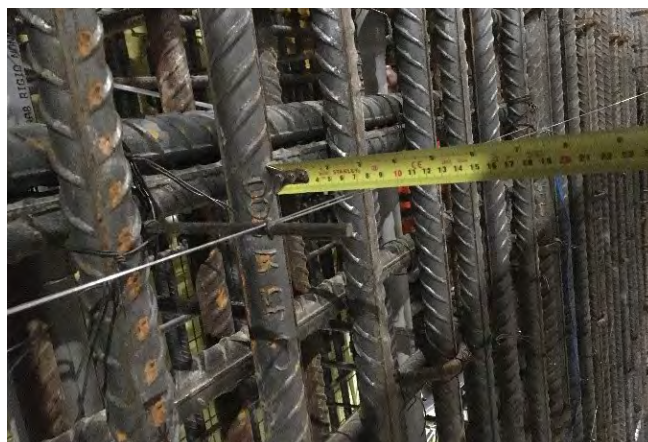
Shotcrete inspector measuring the concrete cover between the front mat of rebar and the shooting wires which are stretched taut and define cover and line and finishing grade.
